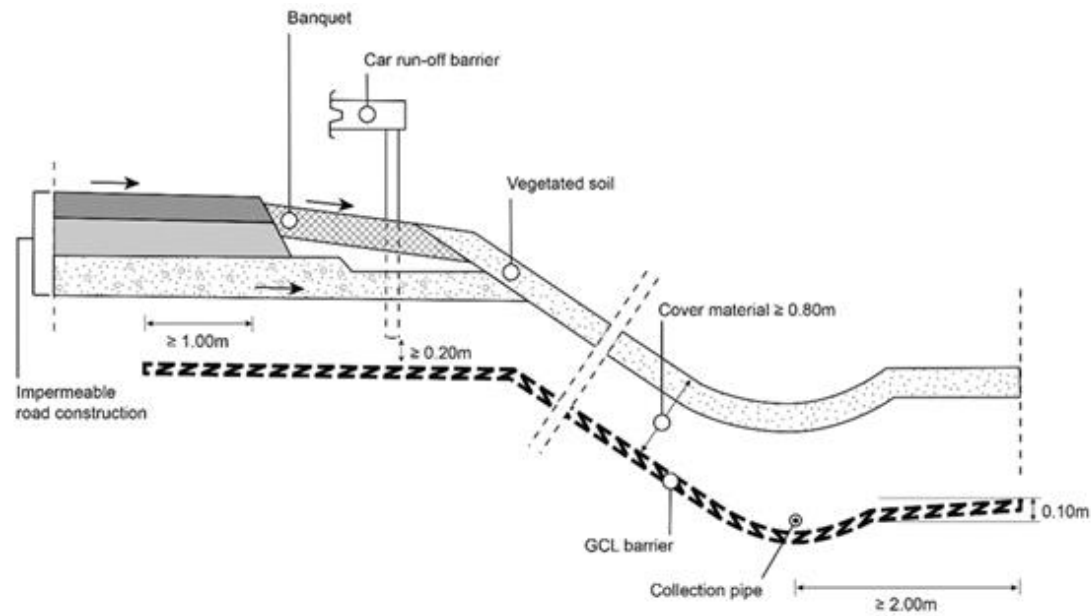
Groundwater protection for a road dam construction [according to 5]
